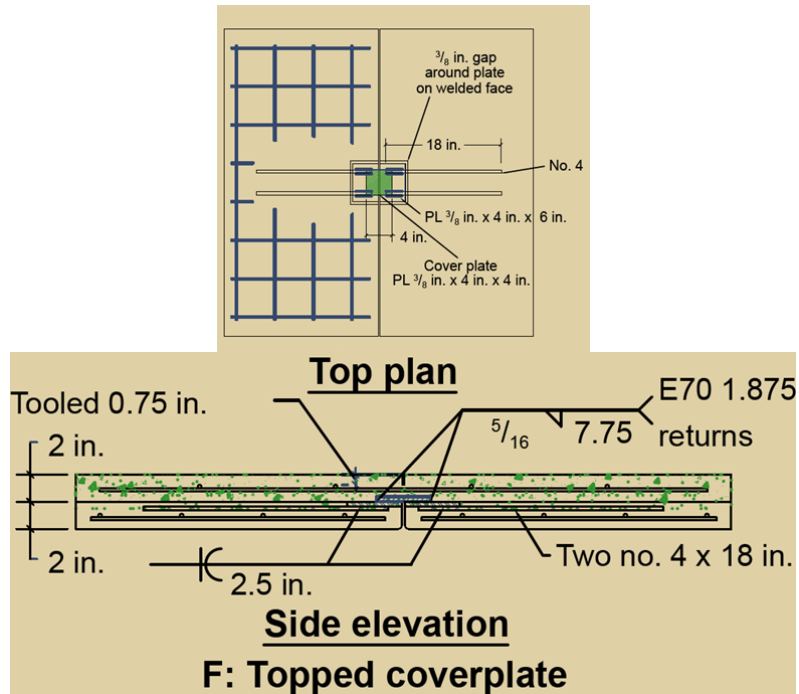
fourth type of connection tested by Naito and Cao horizontal (steel plate embedded in each slabs and joined with one welded flange and a cast-in-place concrete topping)
